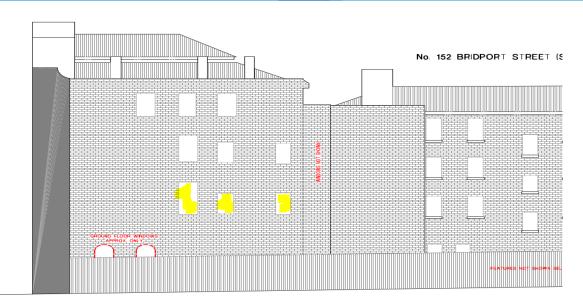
Screenshot of first floor east facing Biltmore windows. Source: Source: Plan of Reestablishment and Detail Survey by JRL Land surveyors
